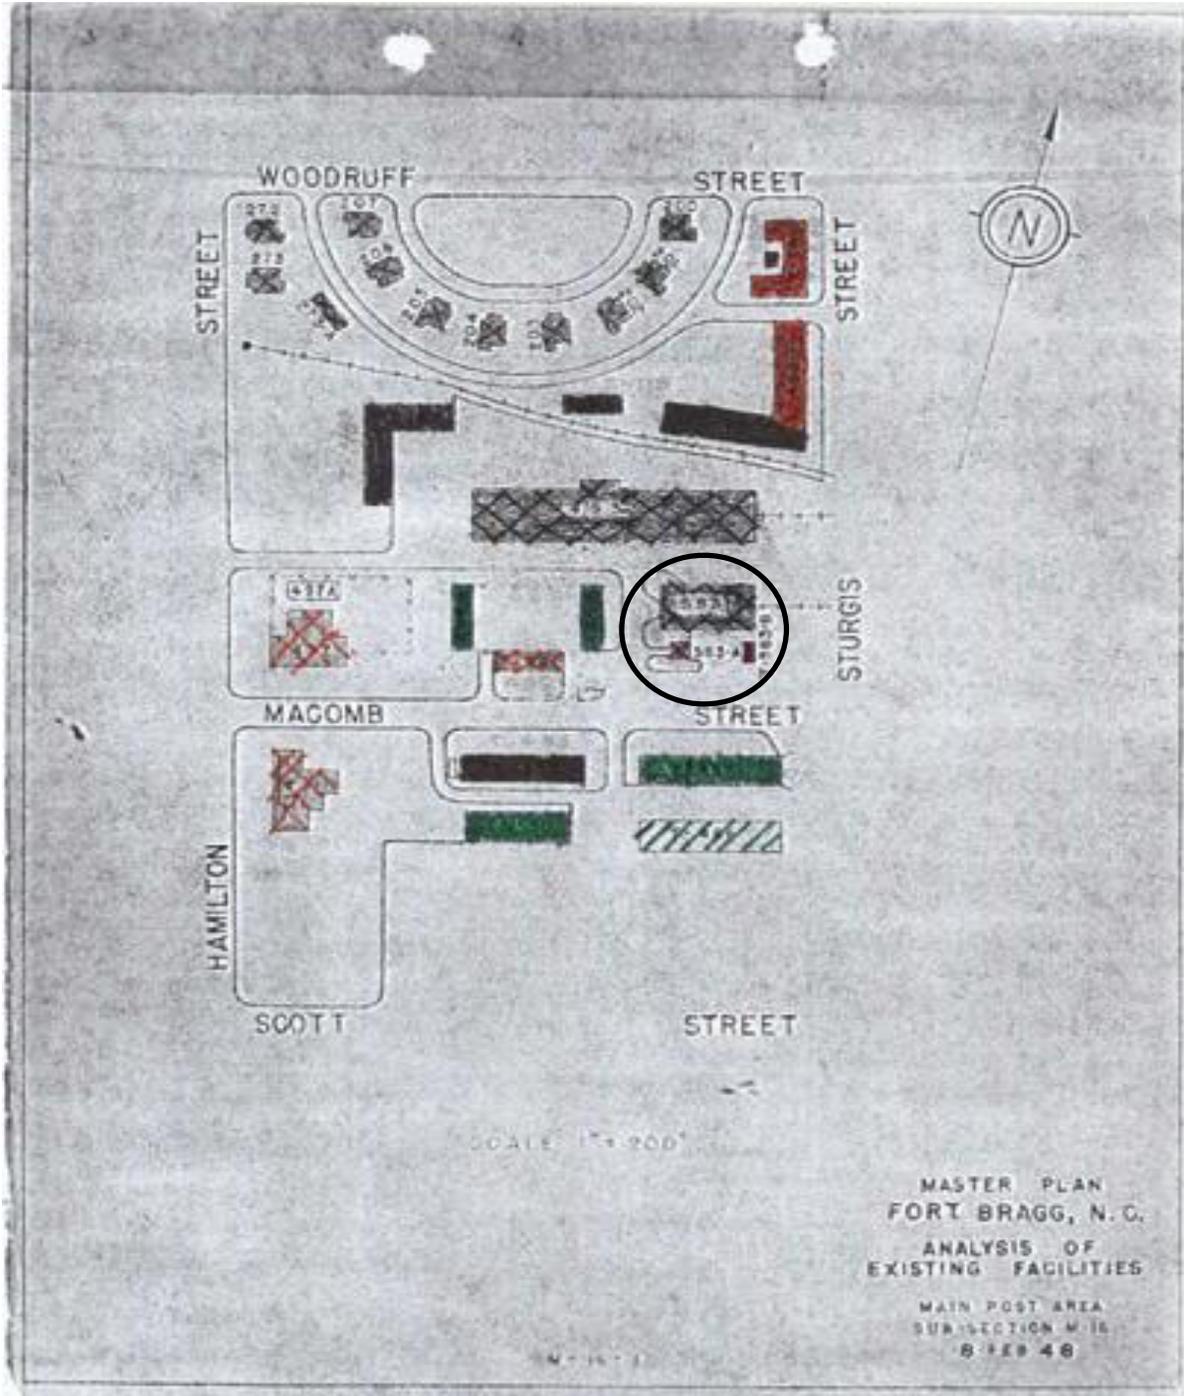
Portion of 1948 Master Plan with building in center right (courtesy PWBC, Fort Bragg).
